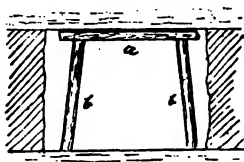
a*, Crowntree. *b b*, Props supporting Roof
